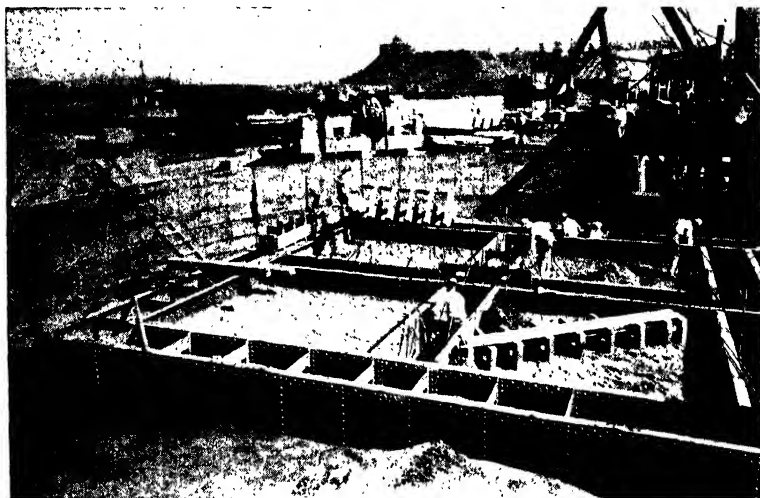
Cutting edge on sand island; first step in lowering concrete pier.
